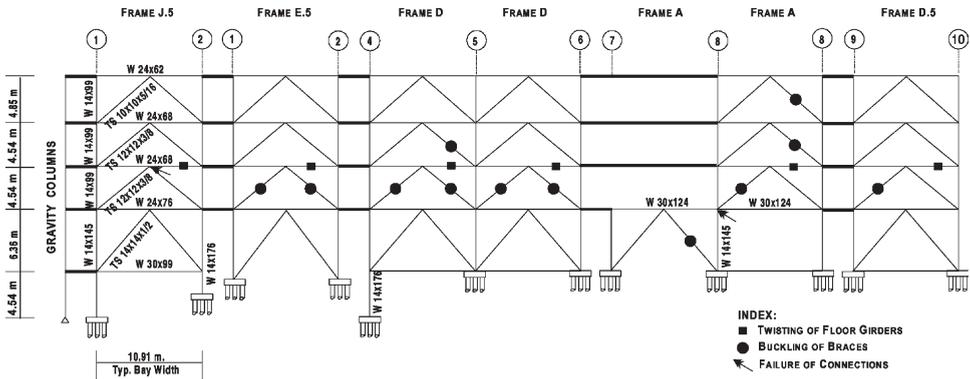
Elevation of all six lateral frames of the study building in the N–S direction and location of observed damage during the Northridge earthquake.
